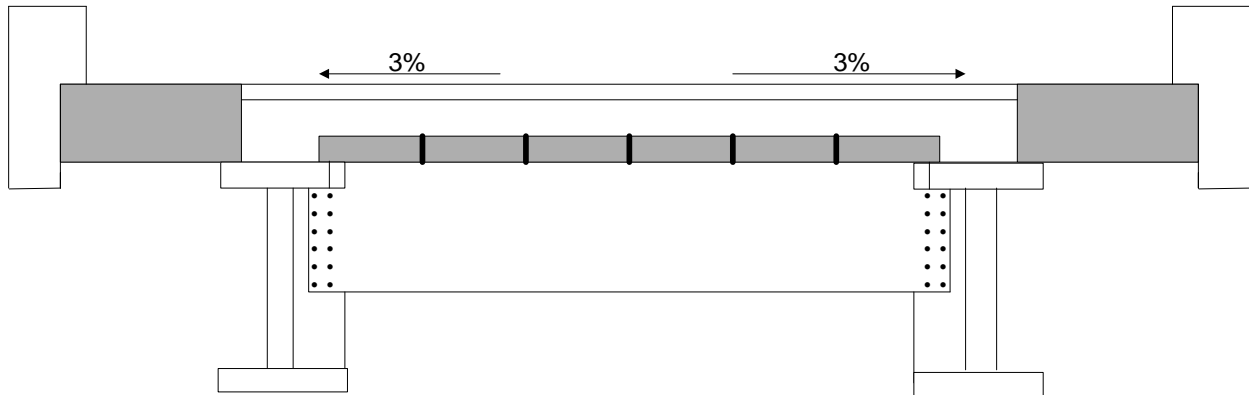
Cross-Section of a typical ladder deck bridge [7]
